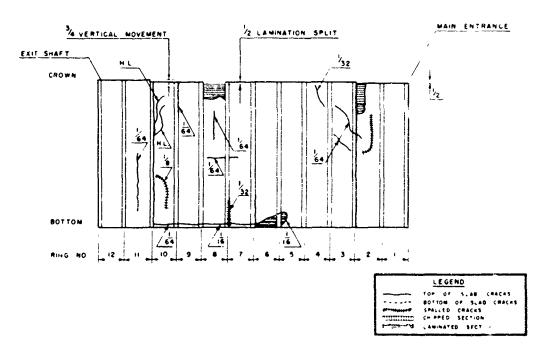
Developed vertical elevation facing away from GZ, structure II-2.
